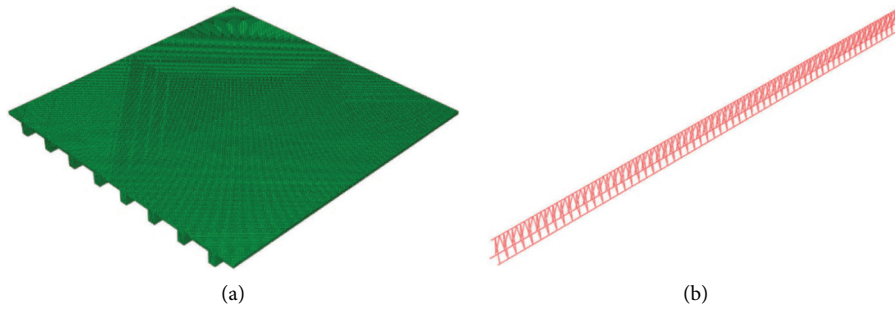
Bidirectional concrete slab finite element model. (a) Set of concrete elements. (b) Steel truss used in joists.
